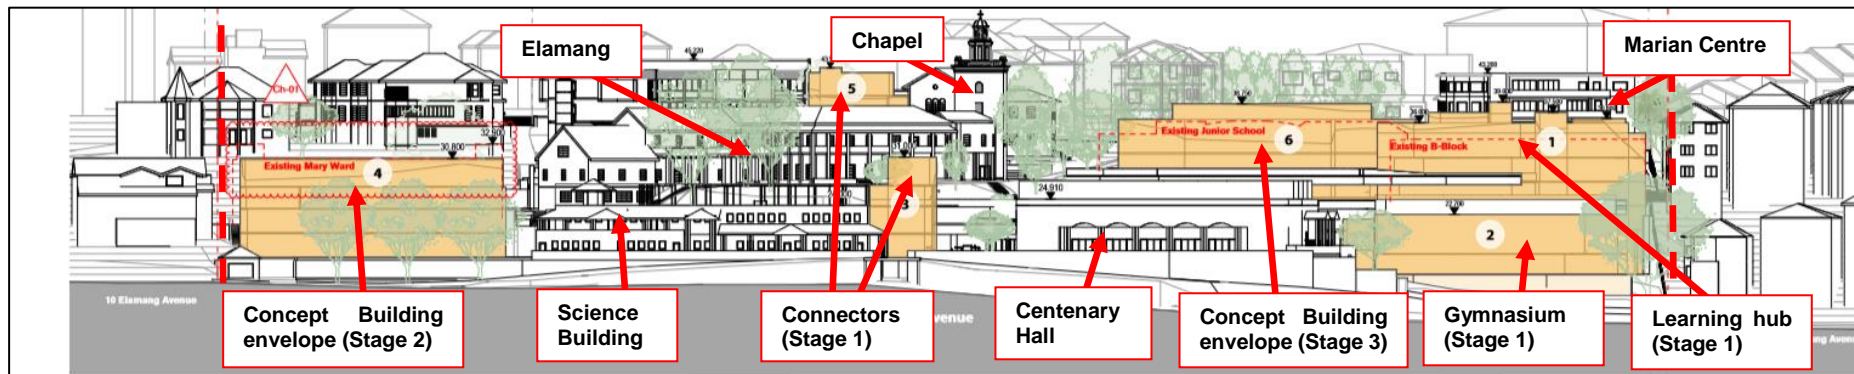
Concept Proposal Envelope elevation (including envelopes of buildings in all stages) – Elamang Avenue (Source: Applicant's RtS)
